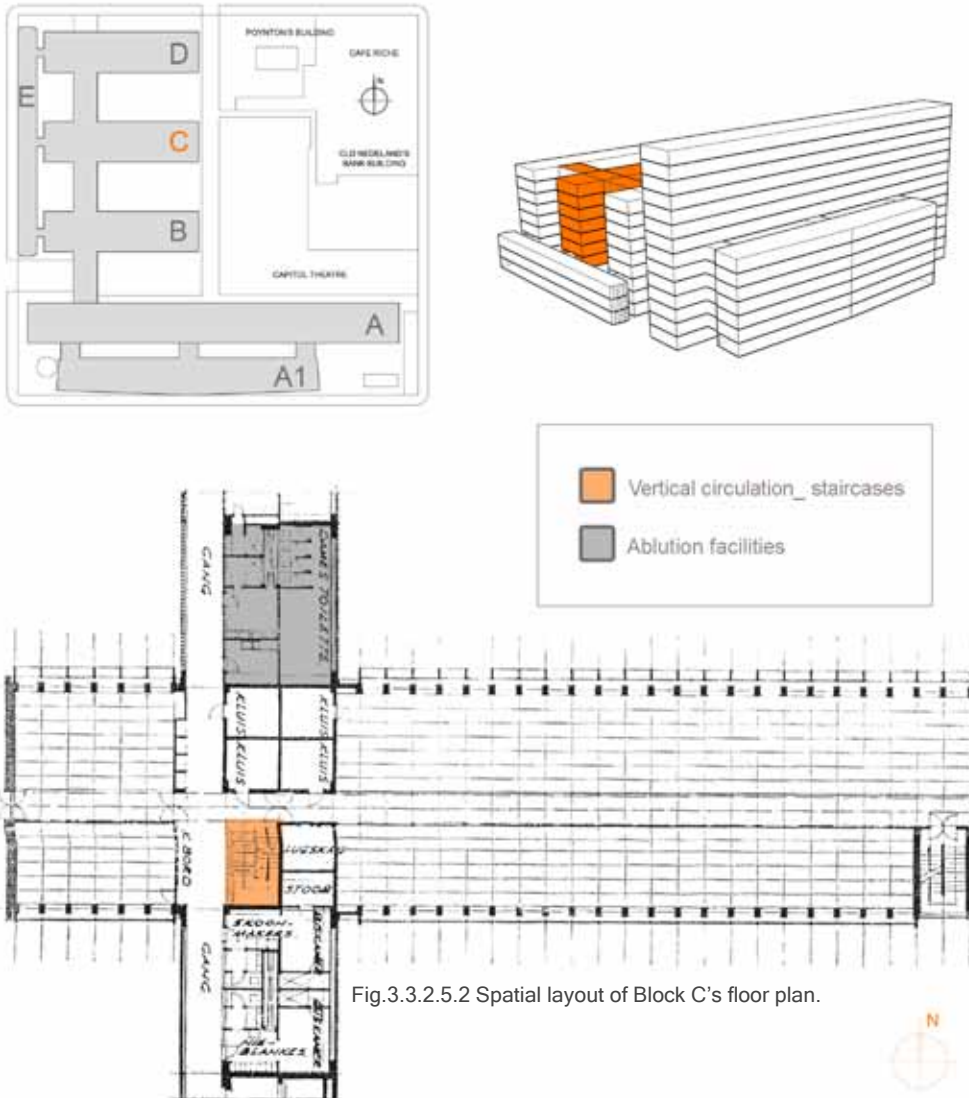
Spatial layout of Block C's floor plan.
